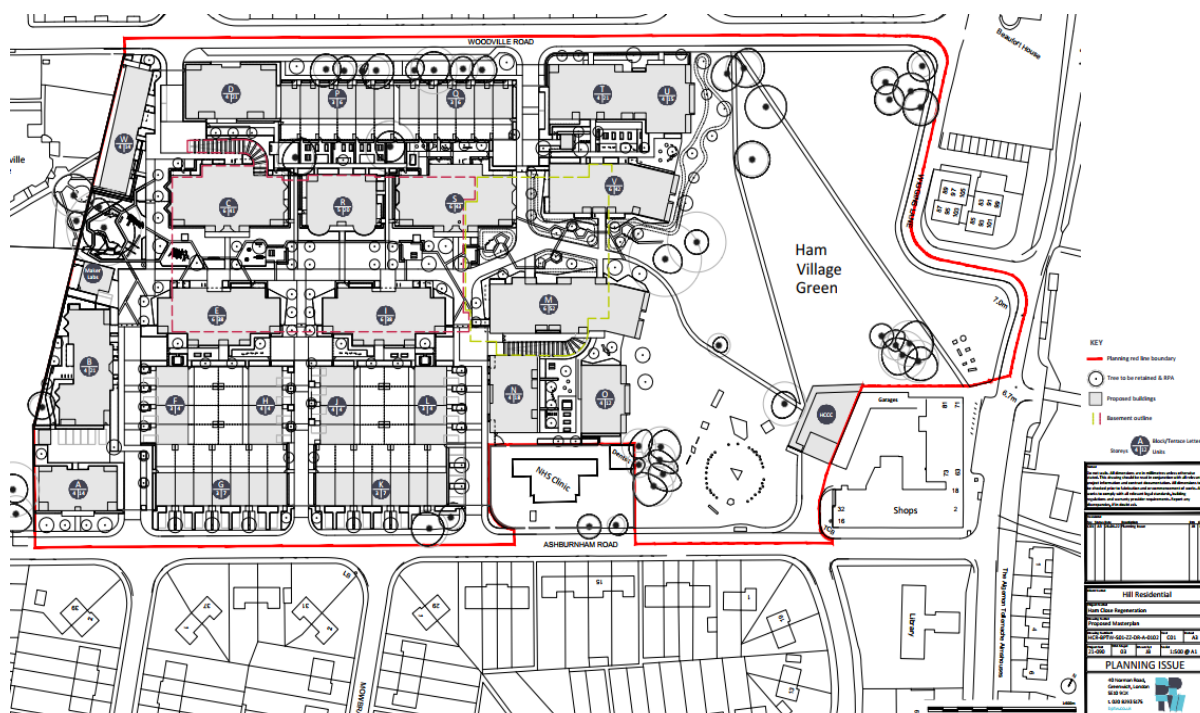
Masterplan providing an overview of the site layout (BPTW drawing HCR-BPTW-S01-ZZ-DR-A-0102-C01)
